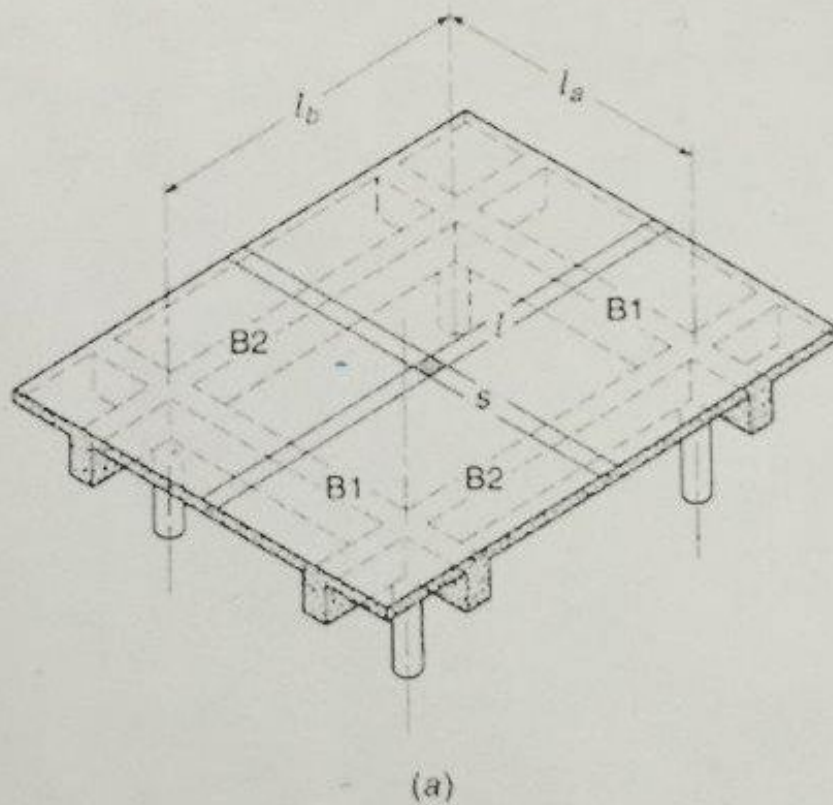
shows a portion of a floor system in which a rectangular slab panel is supported by relatively shallow beams on four sides. The beams, in turn, are carried by columns at the intersection of their centerlines. If a surface load  $q$  is applied, that load is shared between imaginary slab strips  $l_a$  in the short direction and  $l_b$  in the long direction. The portion of the load that is carried by the long strips  $l_b$  is delivered to the beams  $B1$  spanning in the short direction of the panel. The portion carried by the beams  $B1$  plus that carried directly in the short direction by the slab strips  $l_a$  sums up to 100 percent of the load applied to the panel. Similarly, the short-direction slab strips  $l_a$  deliver a part of the load to long direction beams  $B2$ . That load, plus the load carried
